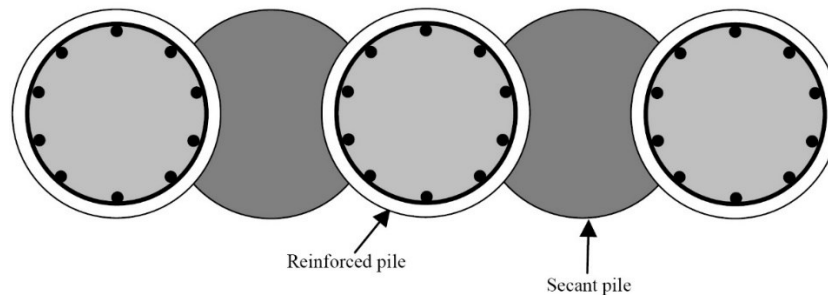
Secant pile wall (Abdallah and Marzouk, 2013)
